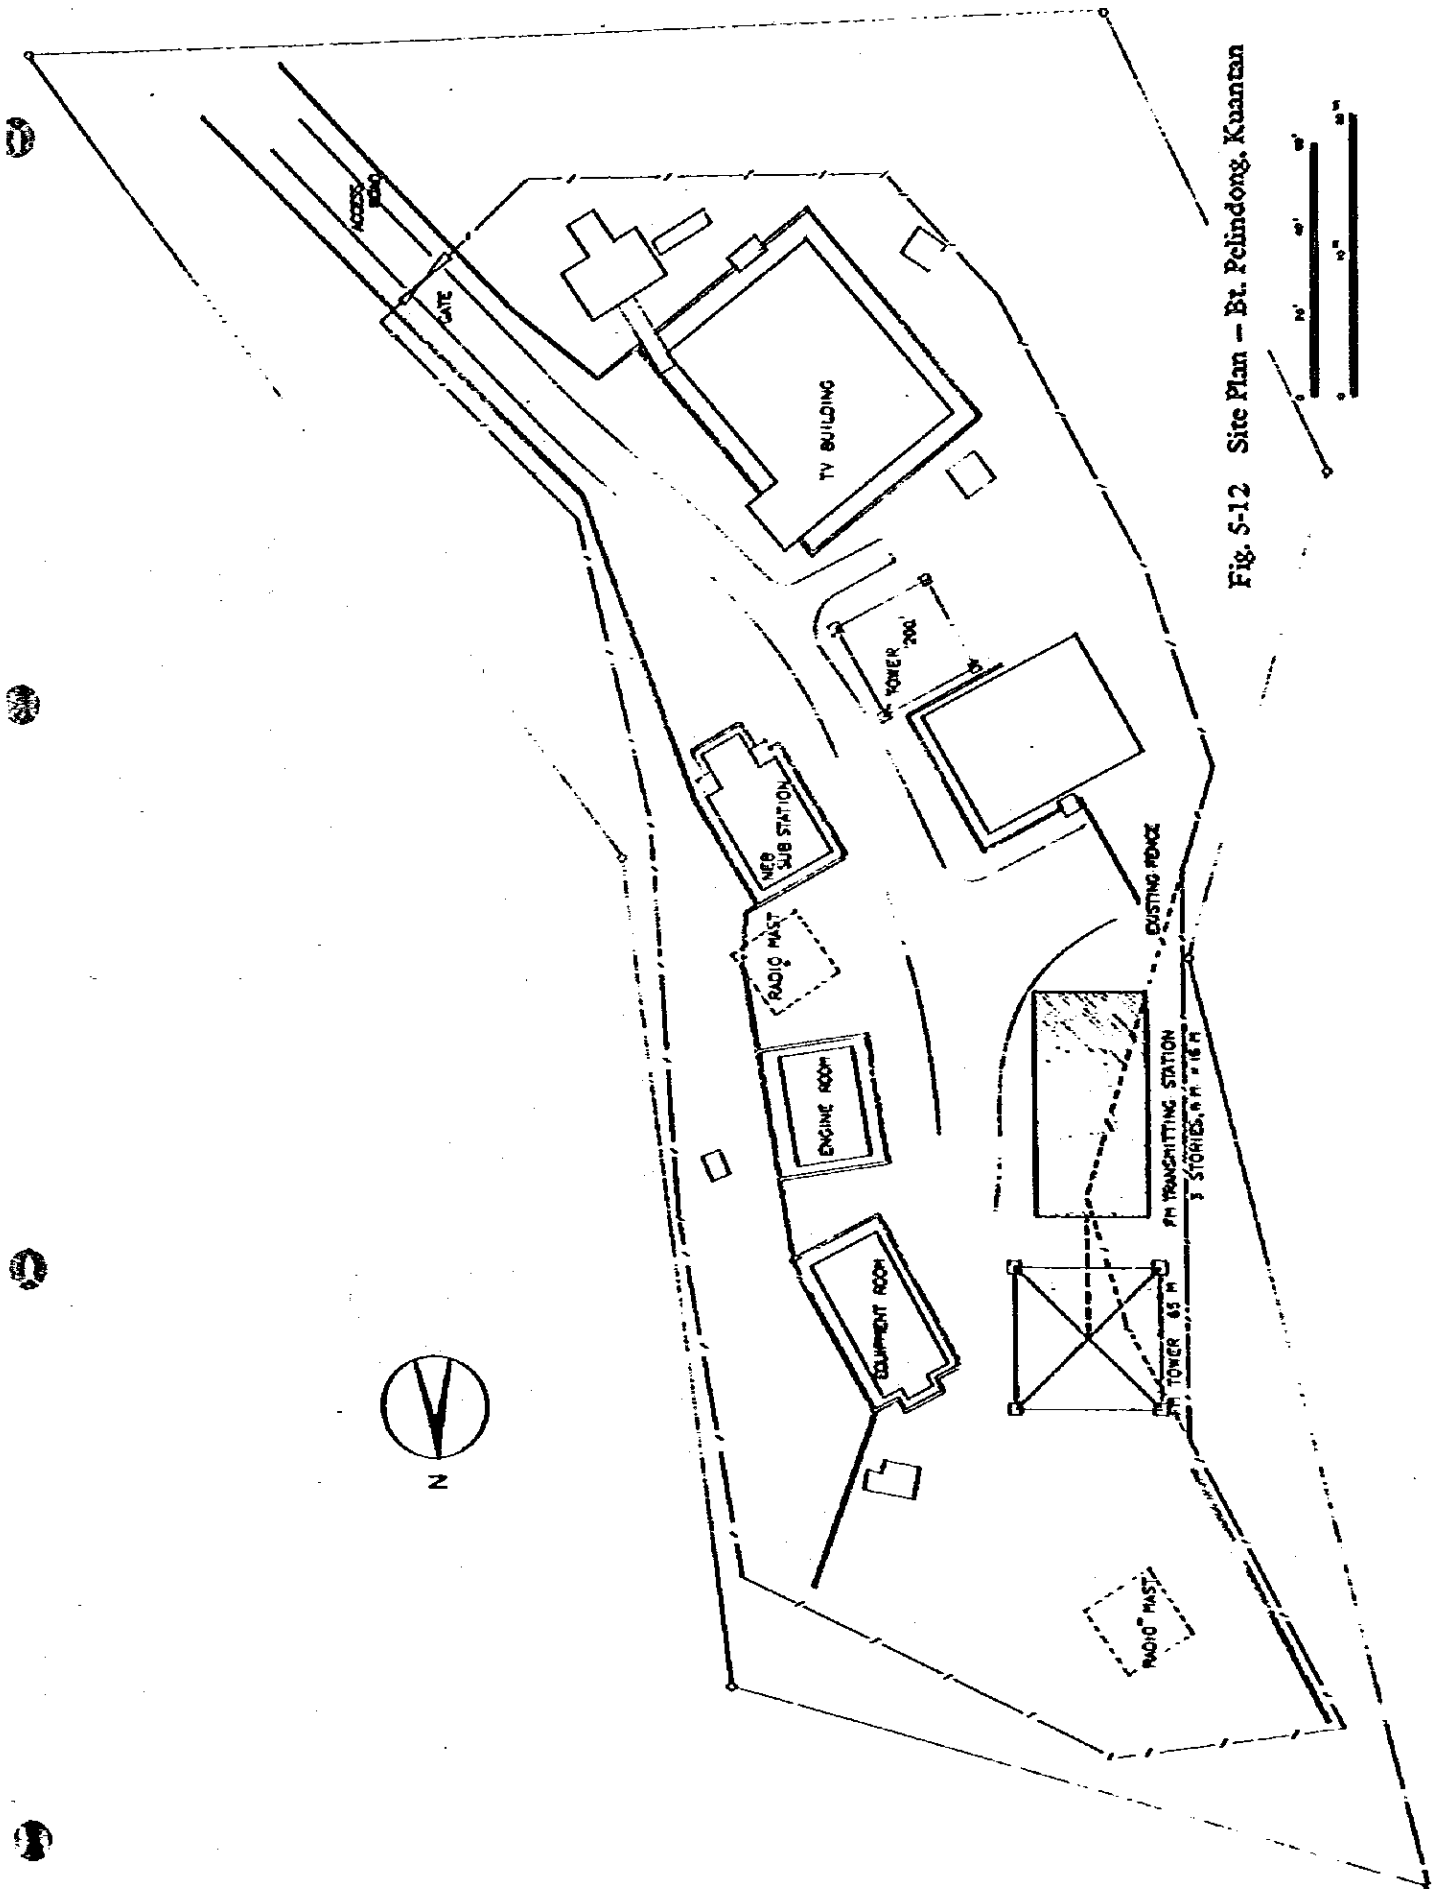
Site Plan - Bt. Pelindong, Kuantan
